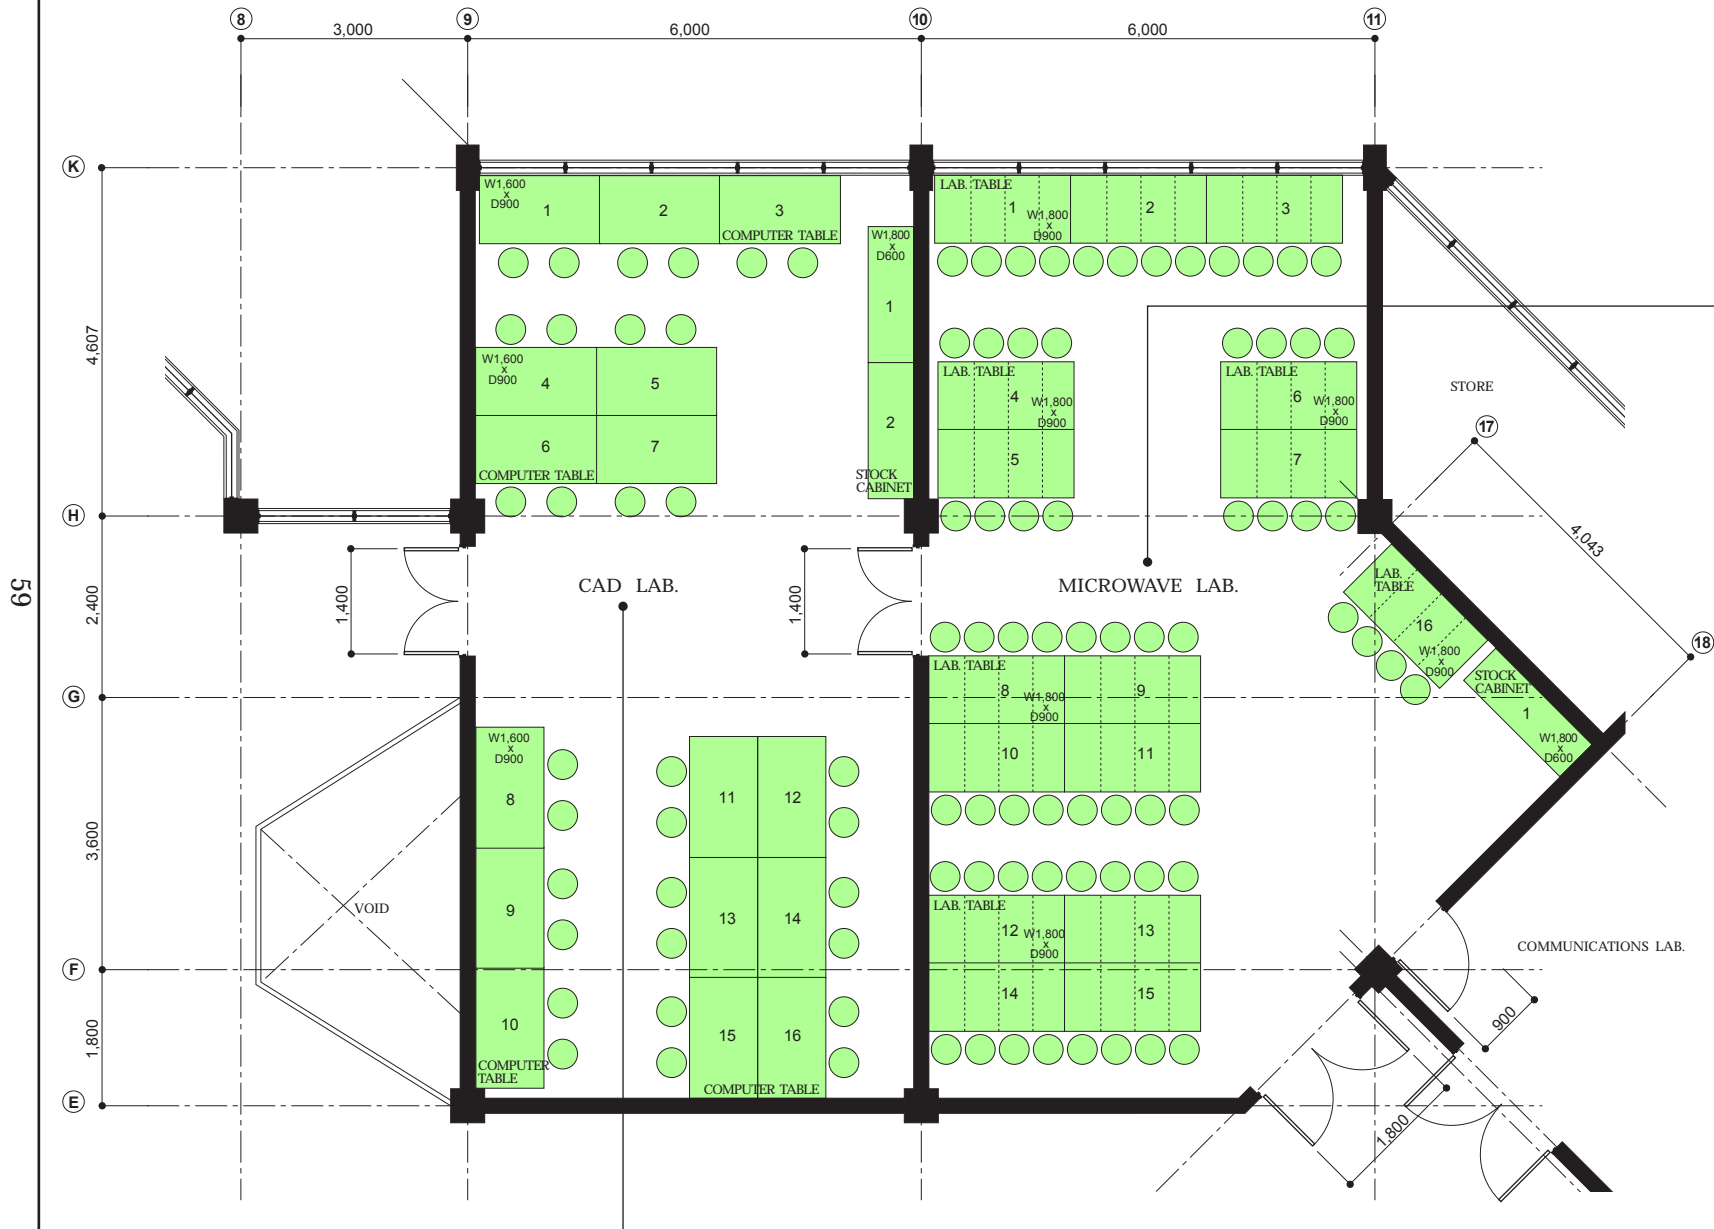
Equipment Layout Plan Telecommunications Lab.
